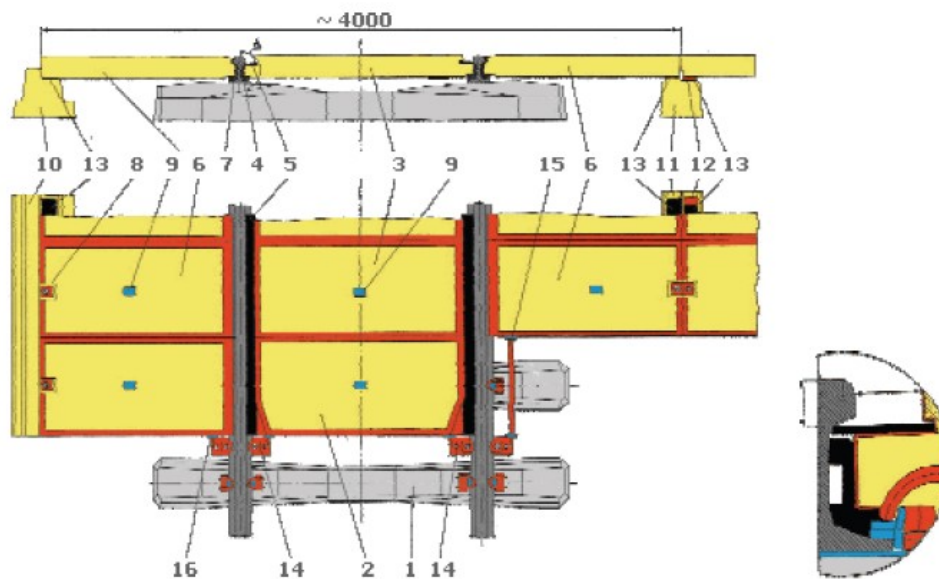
Mirosław type surface (Koc 2013):1- railway sleeper; 2- outer end cross-drive plate; 3- internal drive plate; 4- internal shock absorber; 5- rubber belt; 6- external crossing plate; 7- external shock absorber; 8-screw; 9-polyurethane plug; 10,11-beam support;12-fixing strip; 13-rubber cushioning belt; 14- resistive handle; 15- way connector; 16-polyethylene cap.
